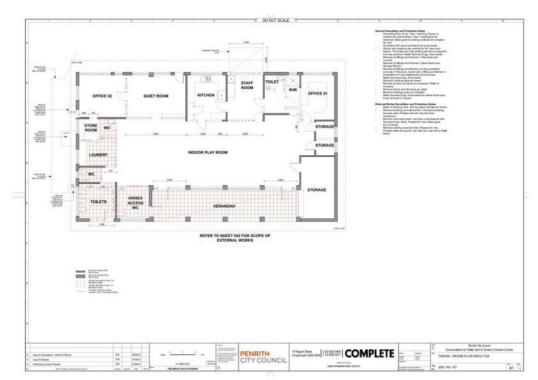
Proposed Demolition Plan Source: Complete Urban Pty Ltd
